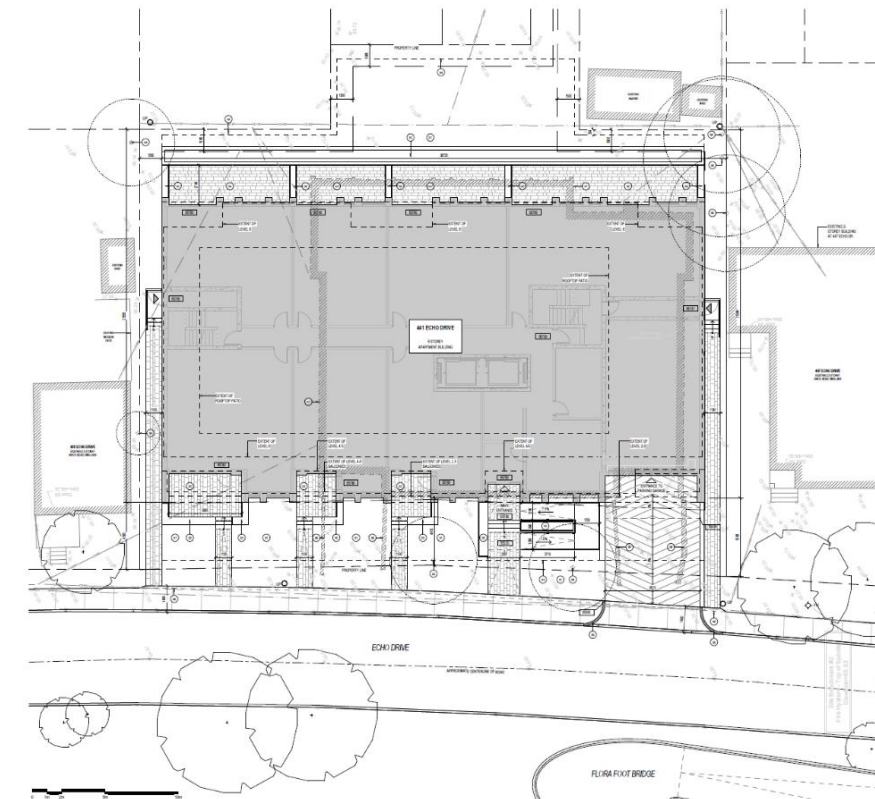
Site plan of 441 Echo Drive (Source: Project1 Studio)
